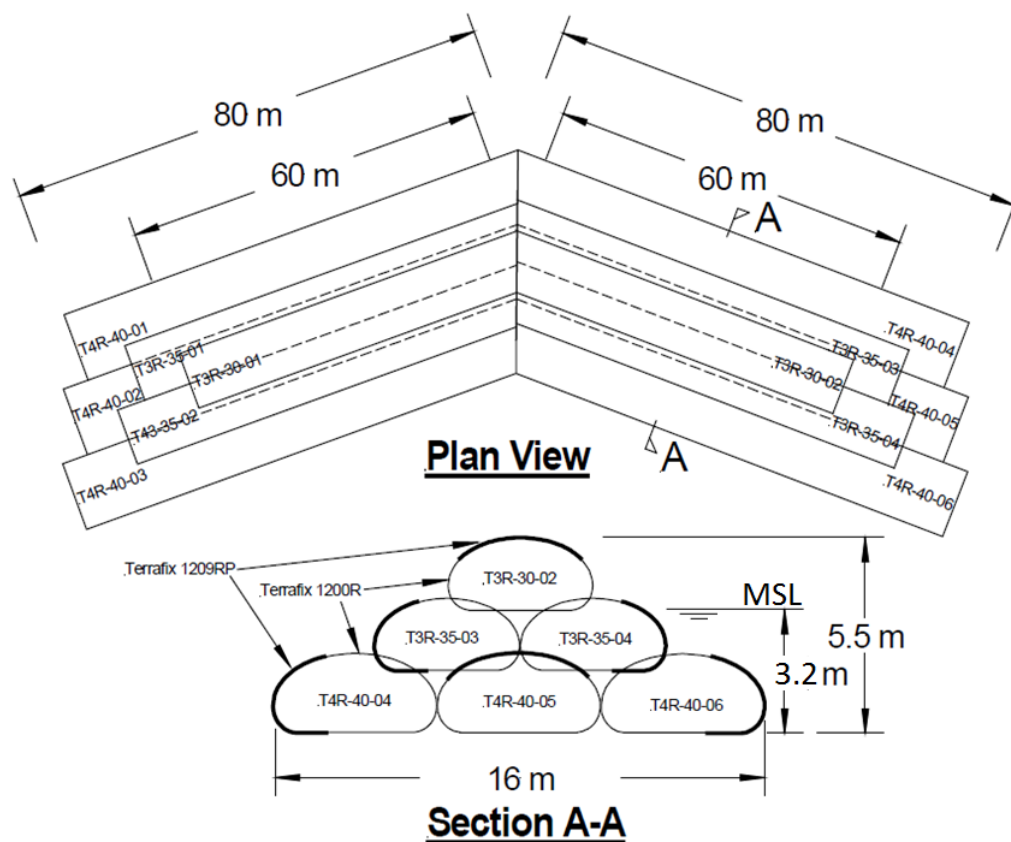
Plan and cross-section of the Limeburners breakwater (W. Hornsey & Jackman 2005)
